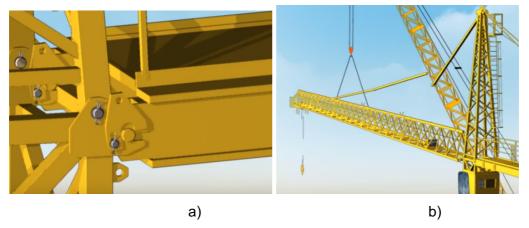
(a) The pin is used to connect the boom with the slewing platform (b) The boom and A-frame connector rod are mounted using the pin
